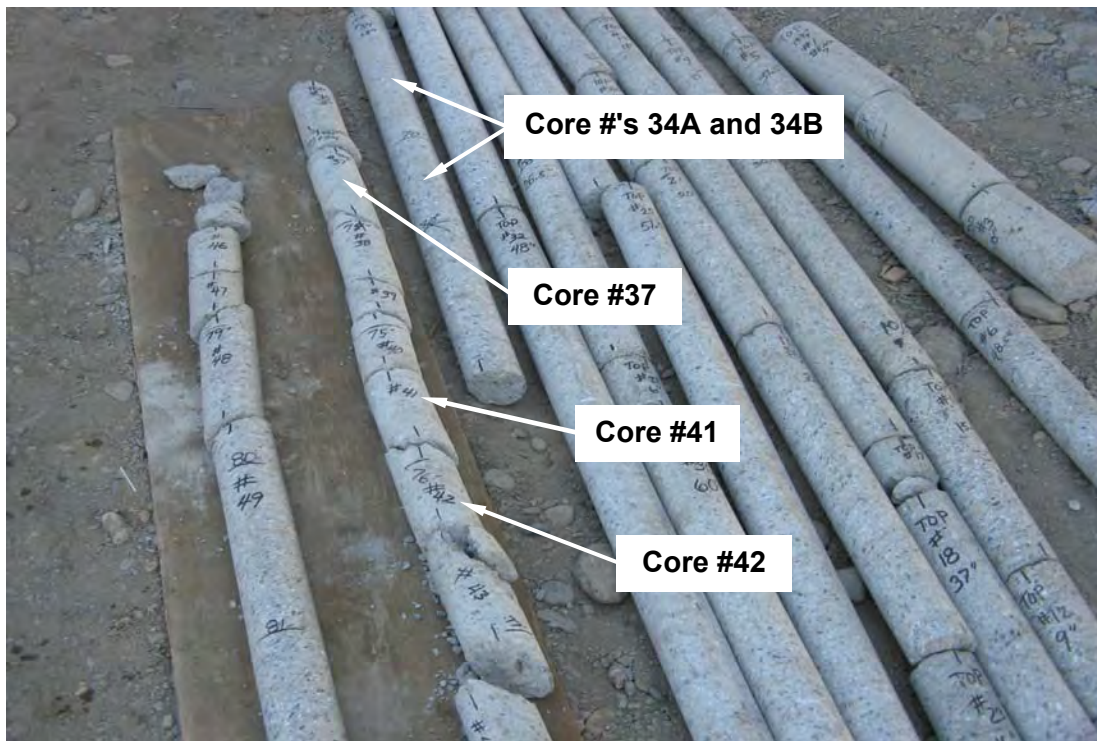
Photograph of a Concrete Core Sections Retrieved from the Thomes Creek Bridge Site (photo provided by Jason Wahleithner)
